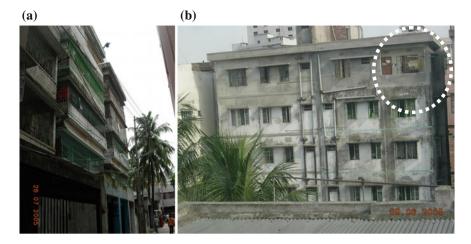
A house with balconies at front (a) only one on back, exposed service pipes (b). *Source* Author
